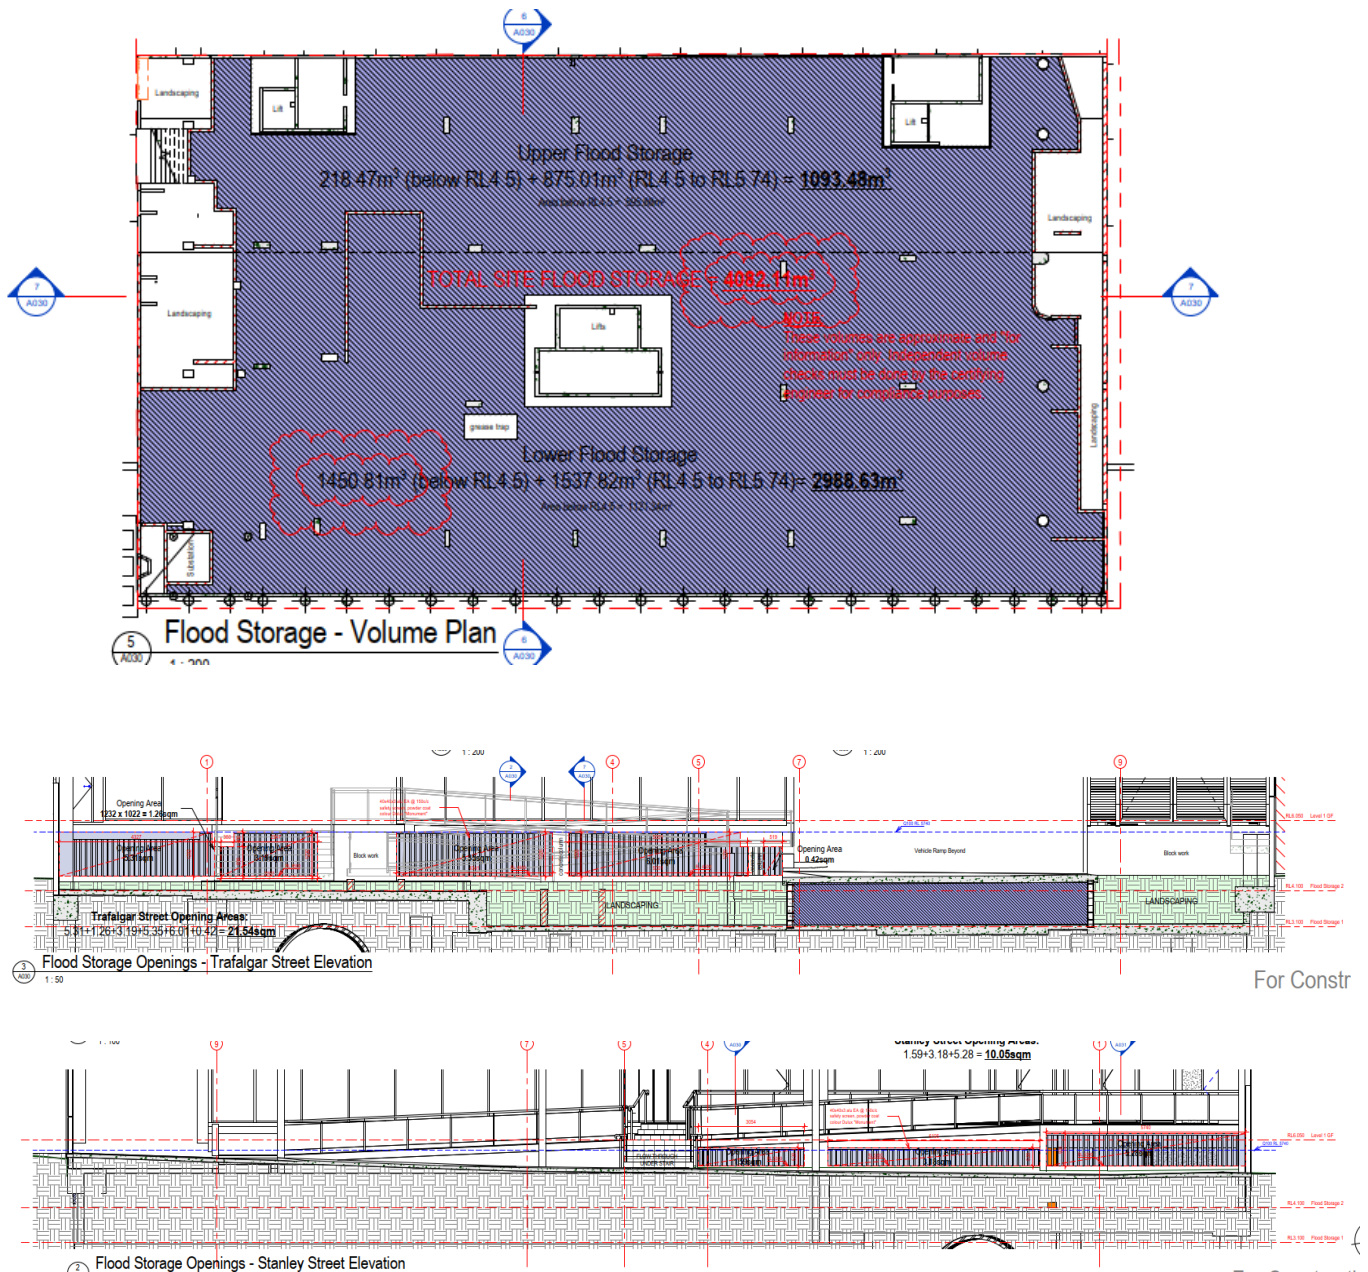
As Constructed Silk 1 Flood Storage Plans
